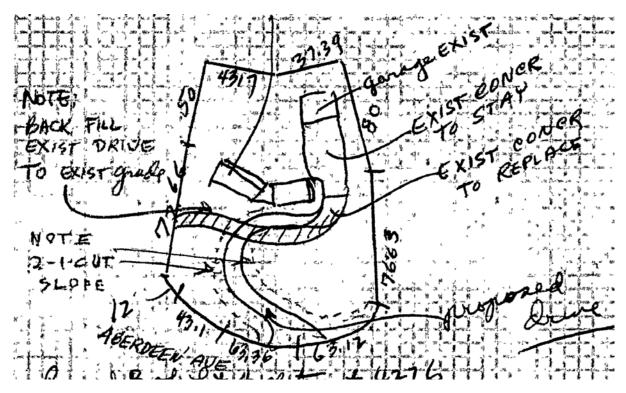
Excerpt from 1964 permit showing re-routing of driveway
